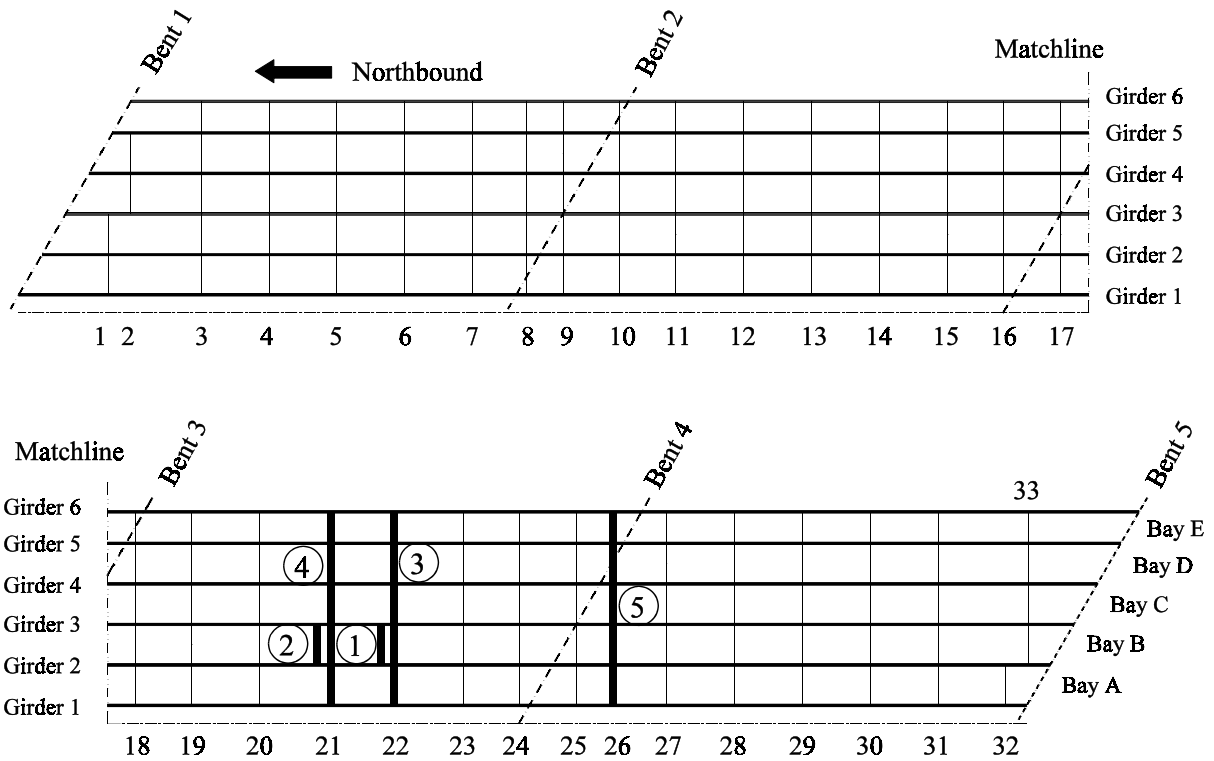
Framing plan of 134.2 m (440 ft) unit.
